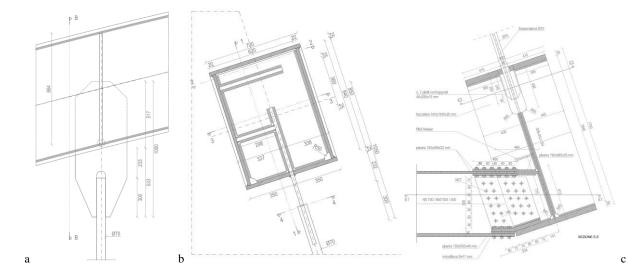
Hanger attachment joints (welded connections) to the arch (a,b) and to the main beam (c). Views of
